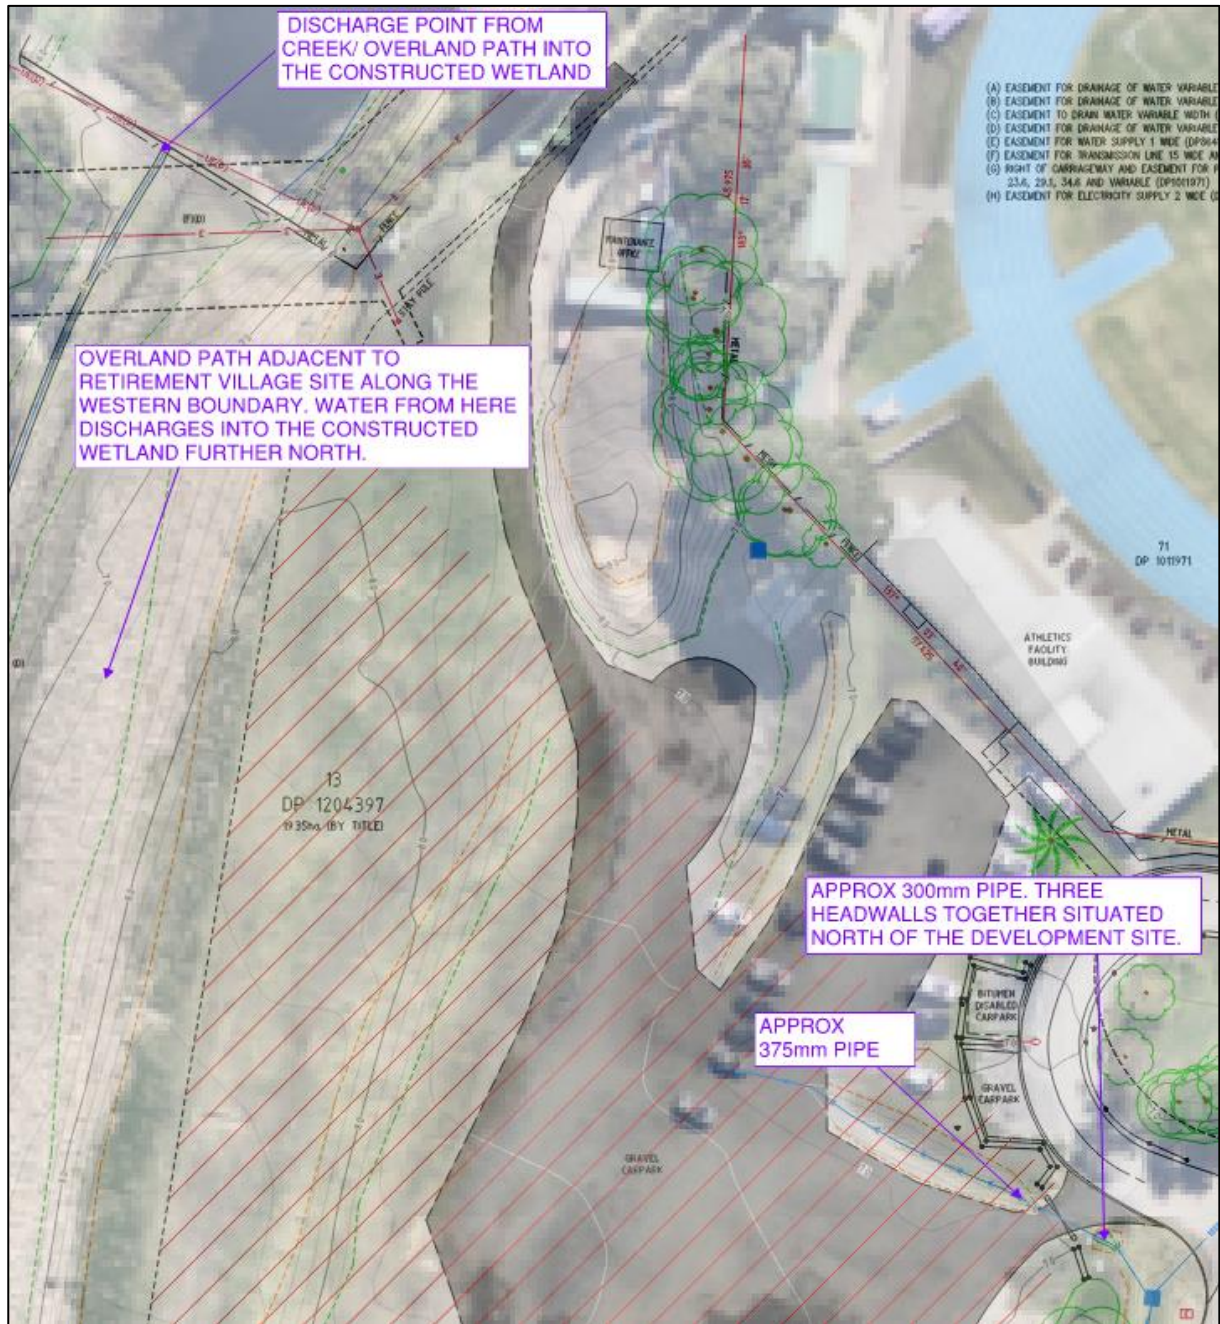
Existing Site Stormwater Network (Source: Beveridge Williams 2023)
